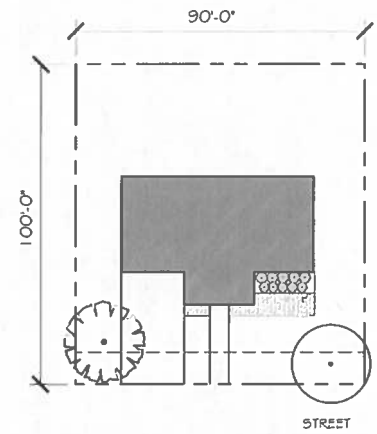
Example Landscape Plan – One-Family and Two-Family Residential
